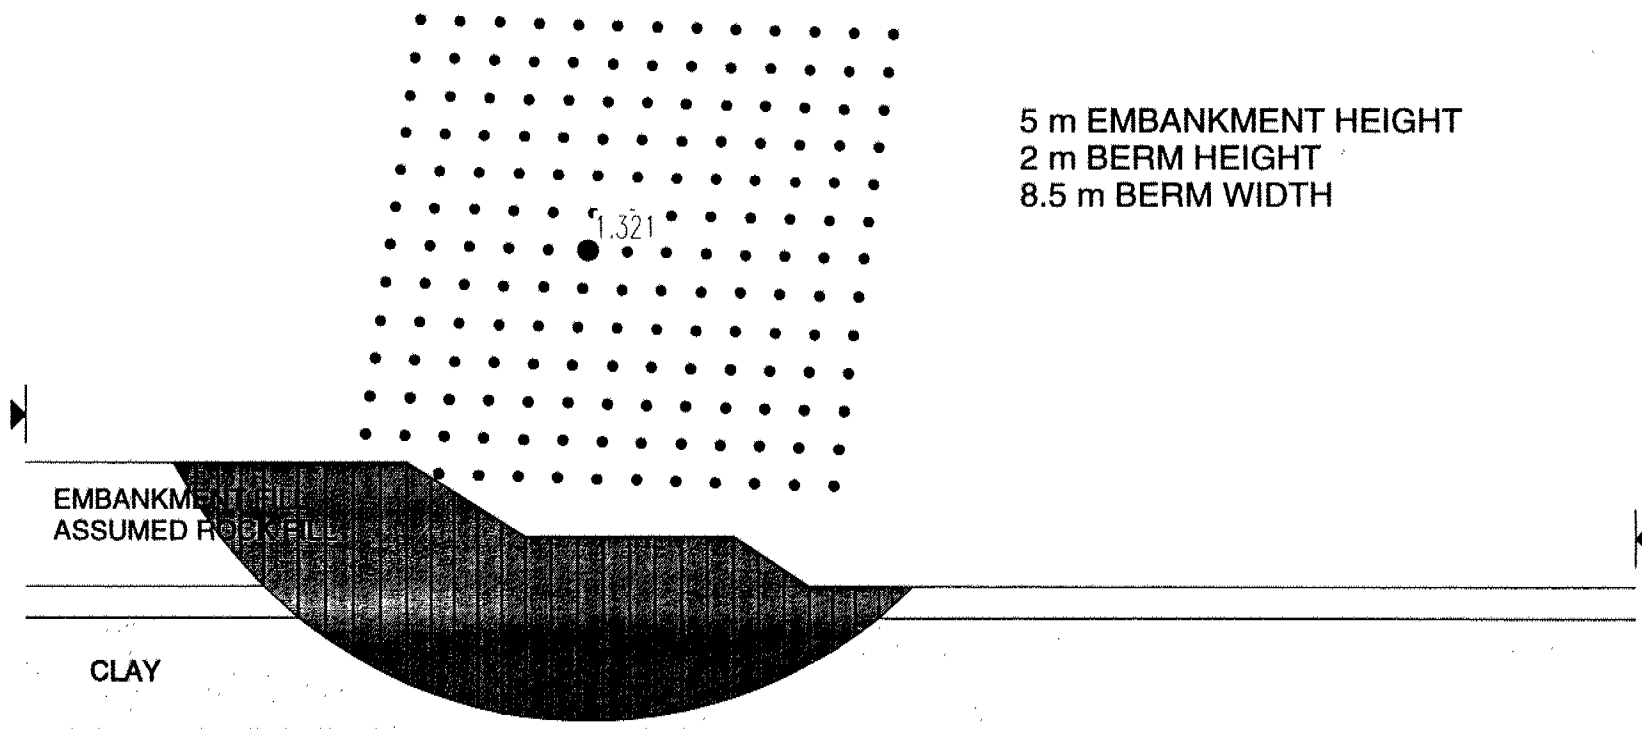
ROAD EMBANKMENT GEOMETRY— PARTIAL OR FULL EXCAVATION OF CLAYEY SOIL STATIONS 21+720 TO 21+810, HIGHWAY 69.
